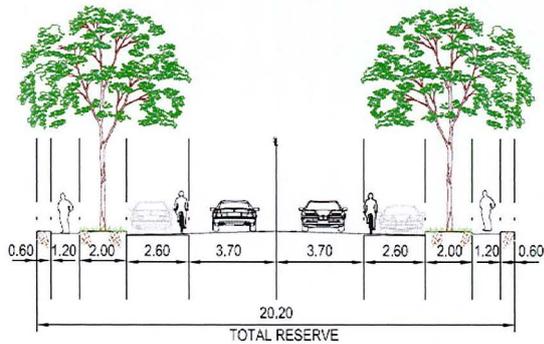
Road Type 2: Collector Road (East-West) with shared path (Briar Road)
